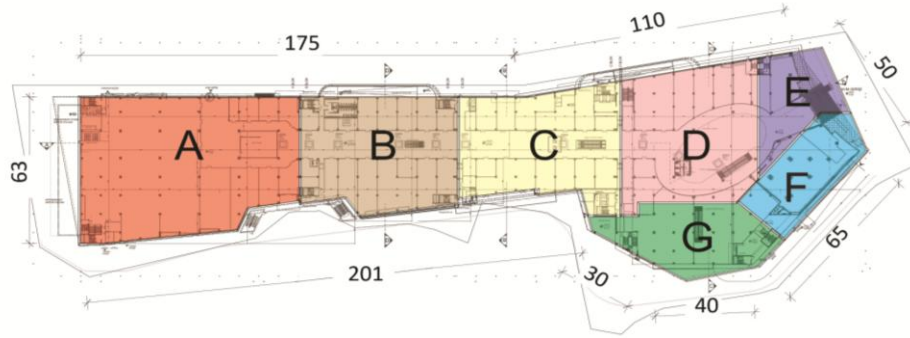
Sanko Park floor plan reprinted from the original documents
